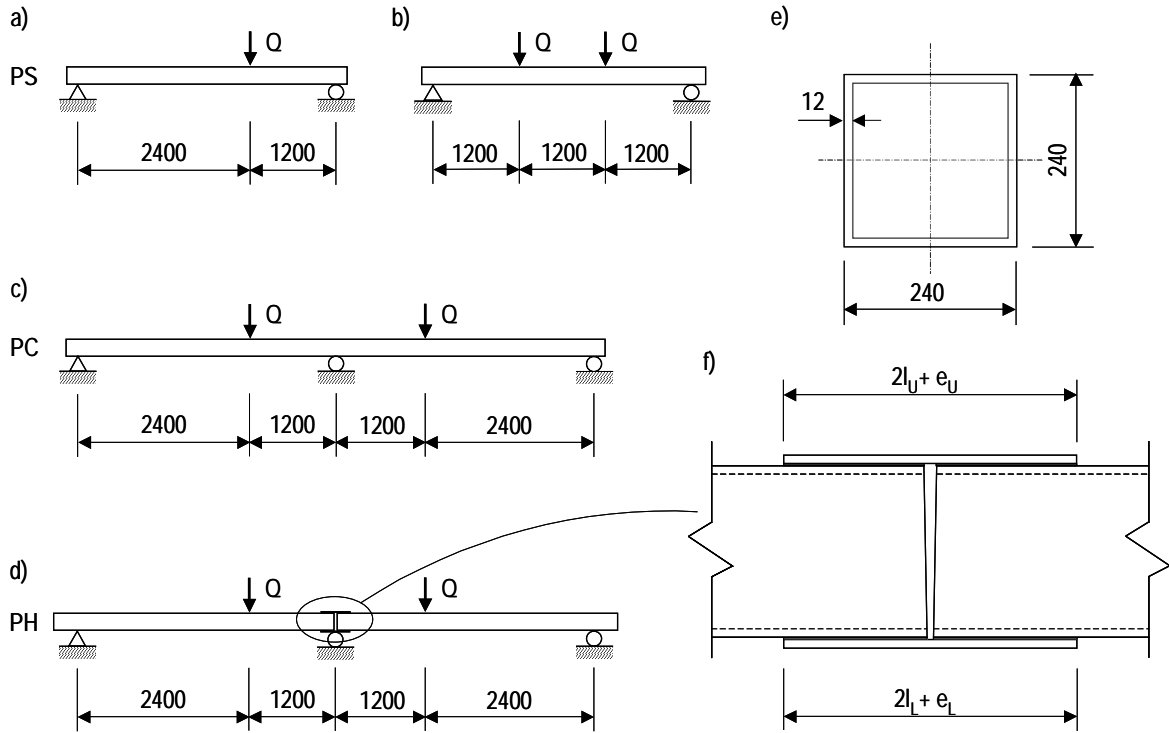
Loading positions: (a) and (b) simple beams PS, (c) continuous beams PC, (d) bonded beams PH (dimensions in mm); (e) Idealized beam section; (f) Joint detail
